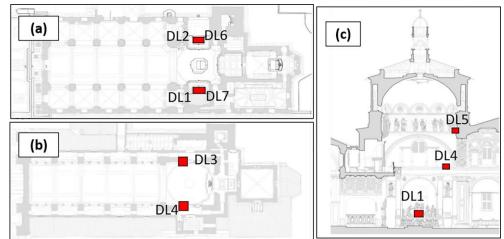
Floor plans and sections of the sanctuary showing the placement of data loggers: (a) 187 ground floor plan, (b) first floor plan, (c) right-side section (Deposition). 188
